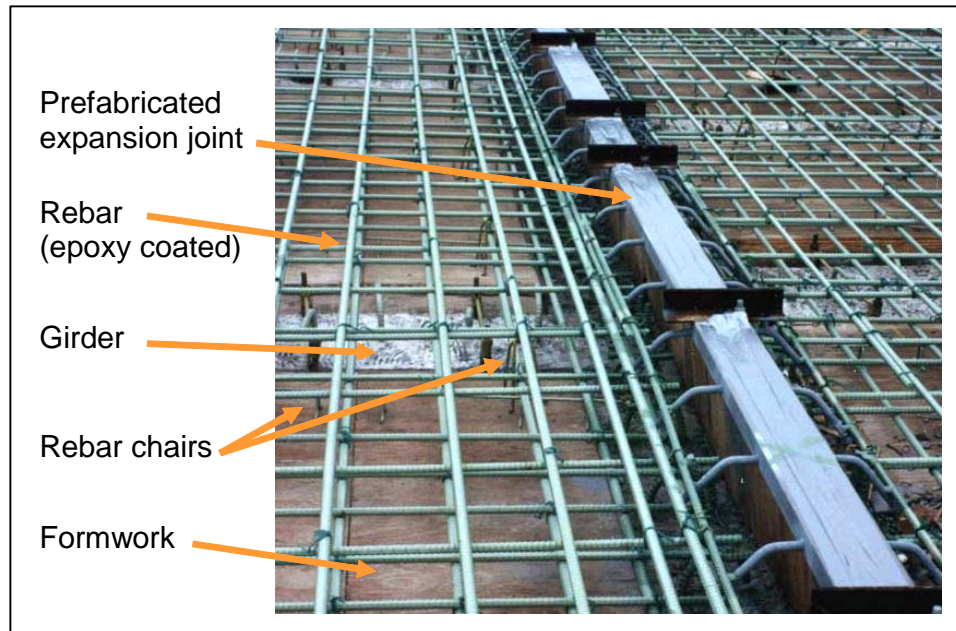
Installation of Deck Slab Reinforcing Steel
